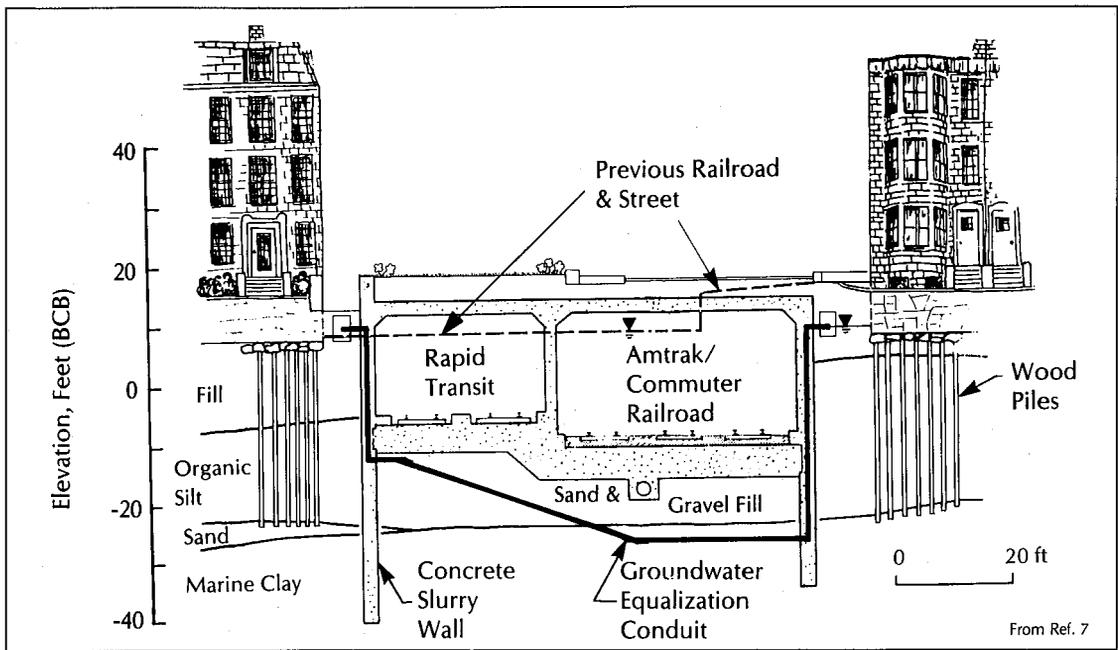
Cross-section of the Southwest Corridor tunnel at Follen Street.
